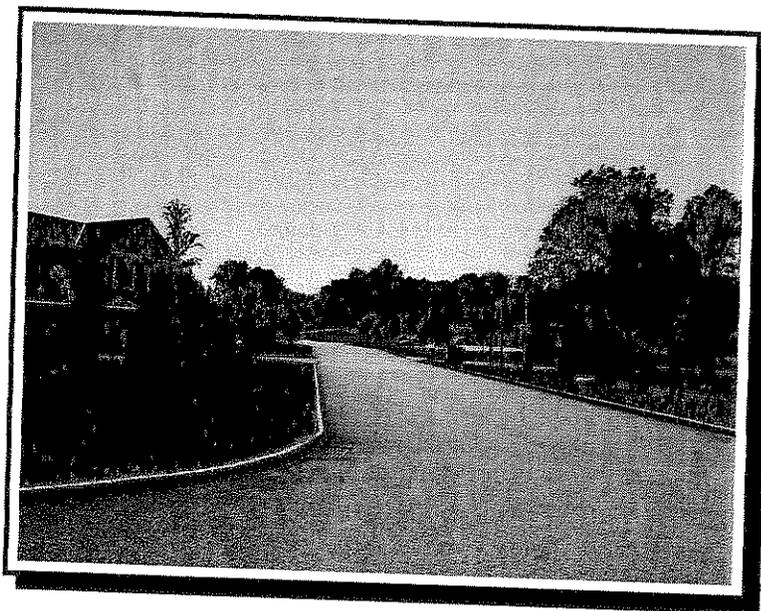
View from site looking west along access road inot overall complex. Note: former athletic fields are located to the right of the access road and a assisted living facility is located to the left of the road.
